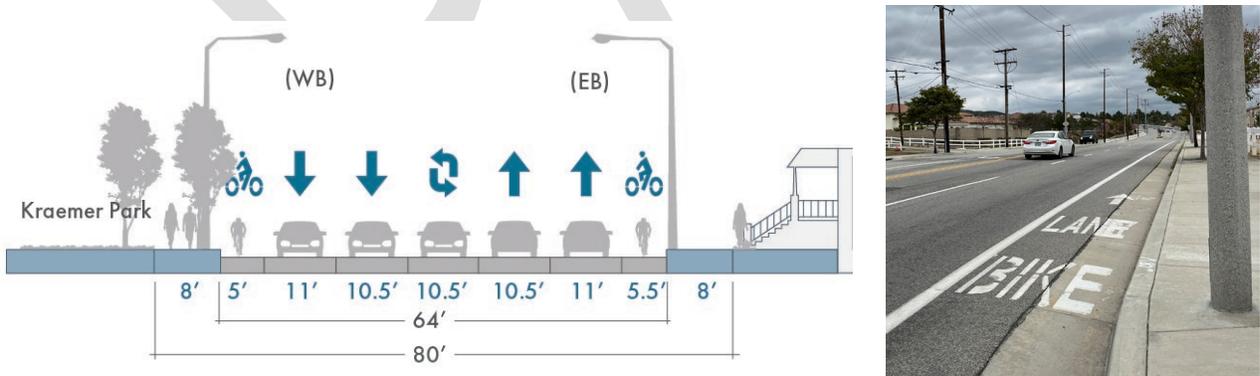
Proposed Street Section, Chapman Avenue East of Bradford Avenue
